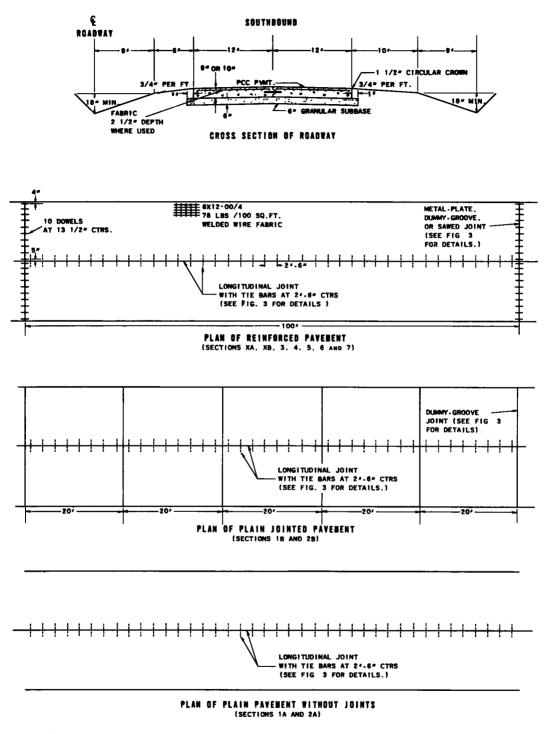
Typical cross-section of roadway, and plan sections of portland cement concrete pavement.
